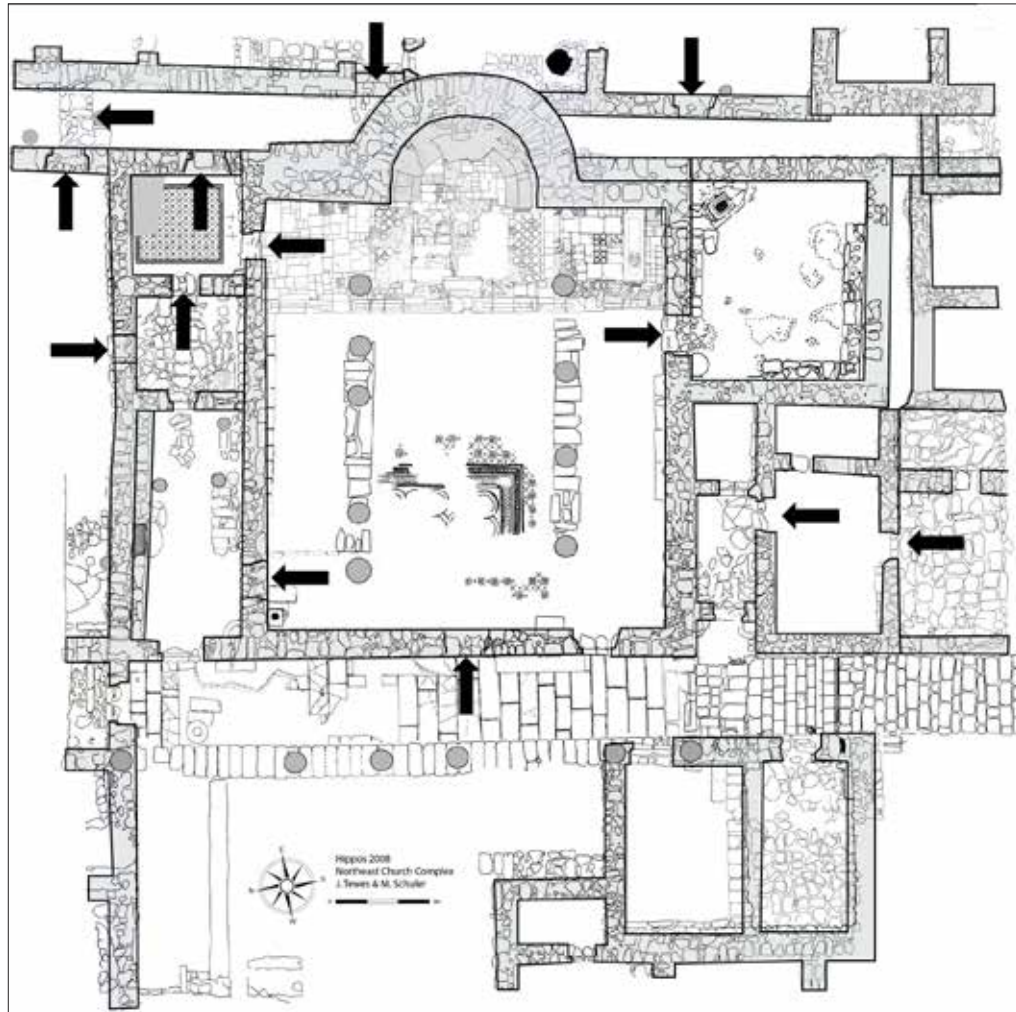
Top plan of the Northeast Church (drawing composite: A. Heiliger, D. Tewes and M. Schuler).
